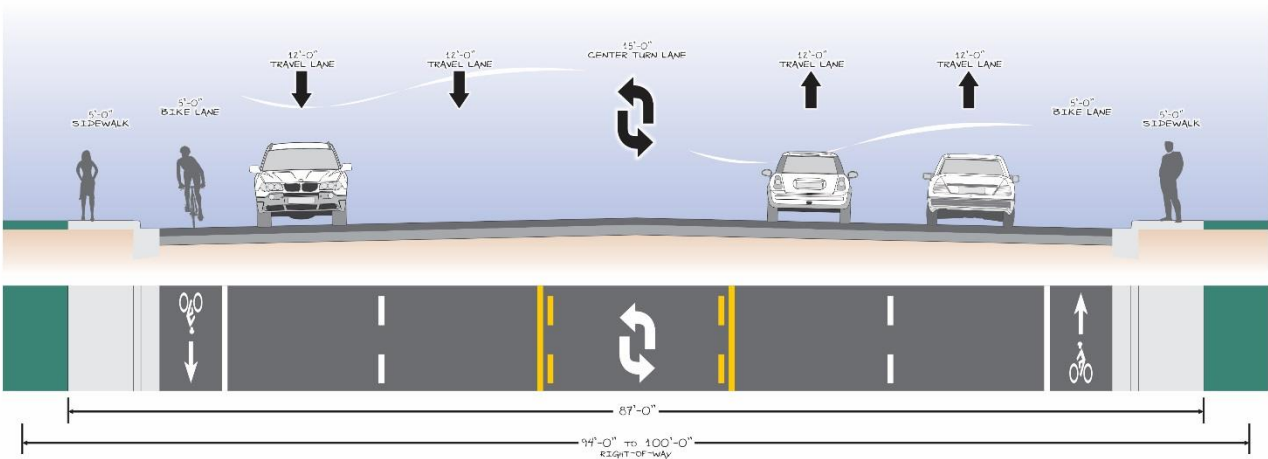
East Butler Road SCDOT APPR Proposed Cross Section
